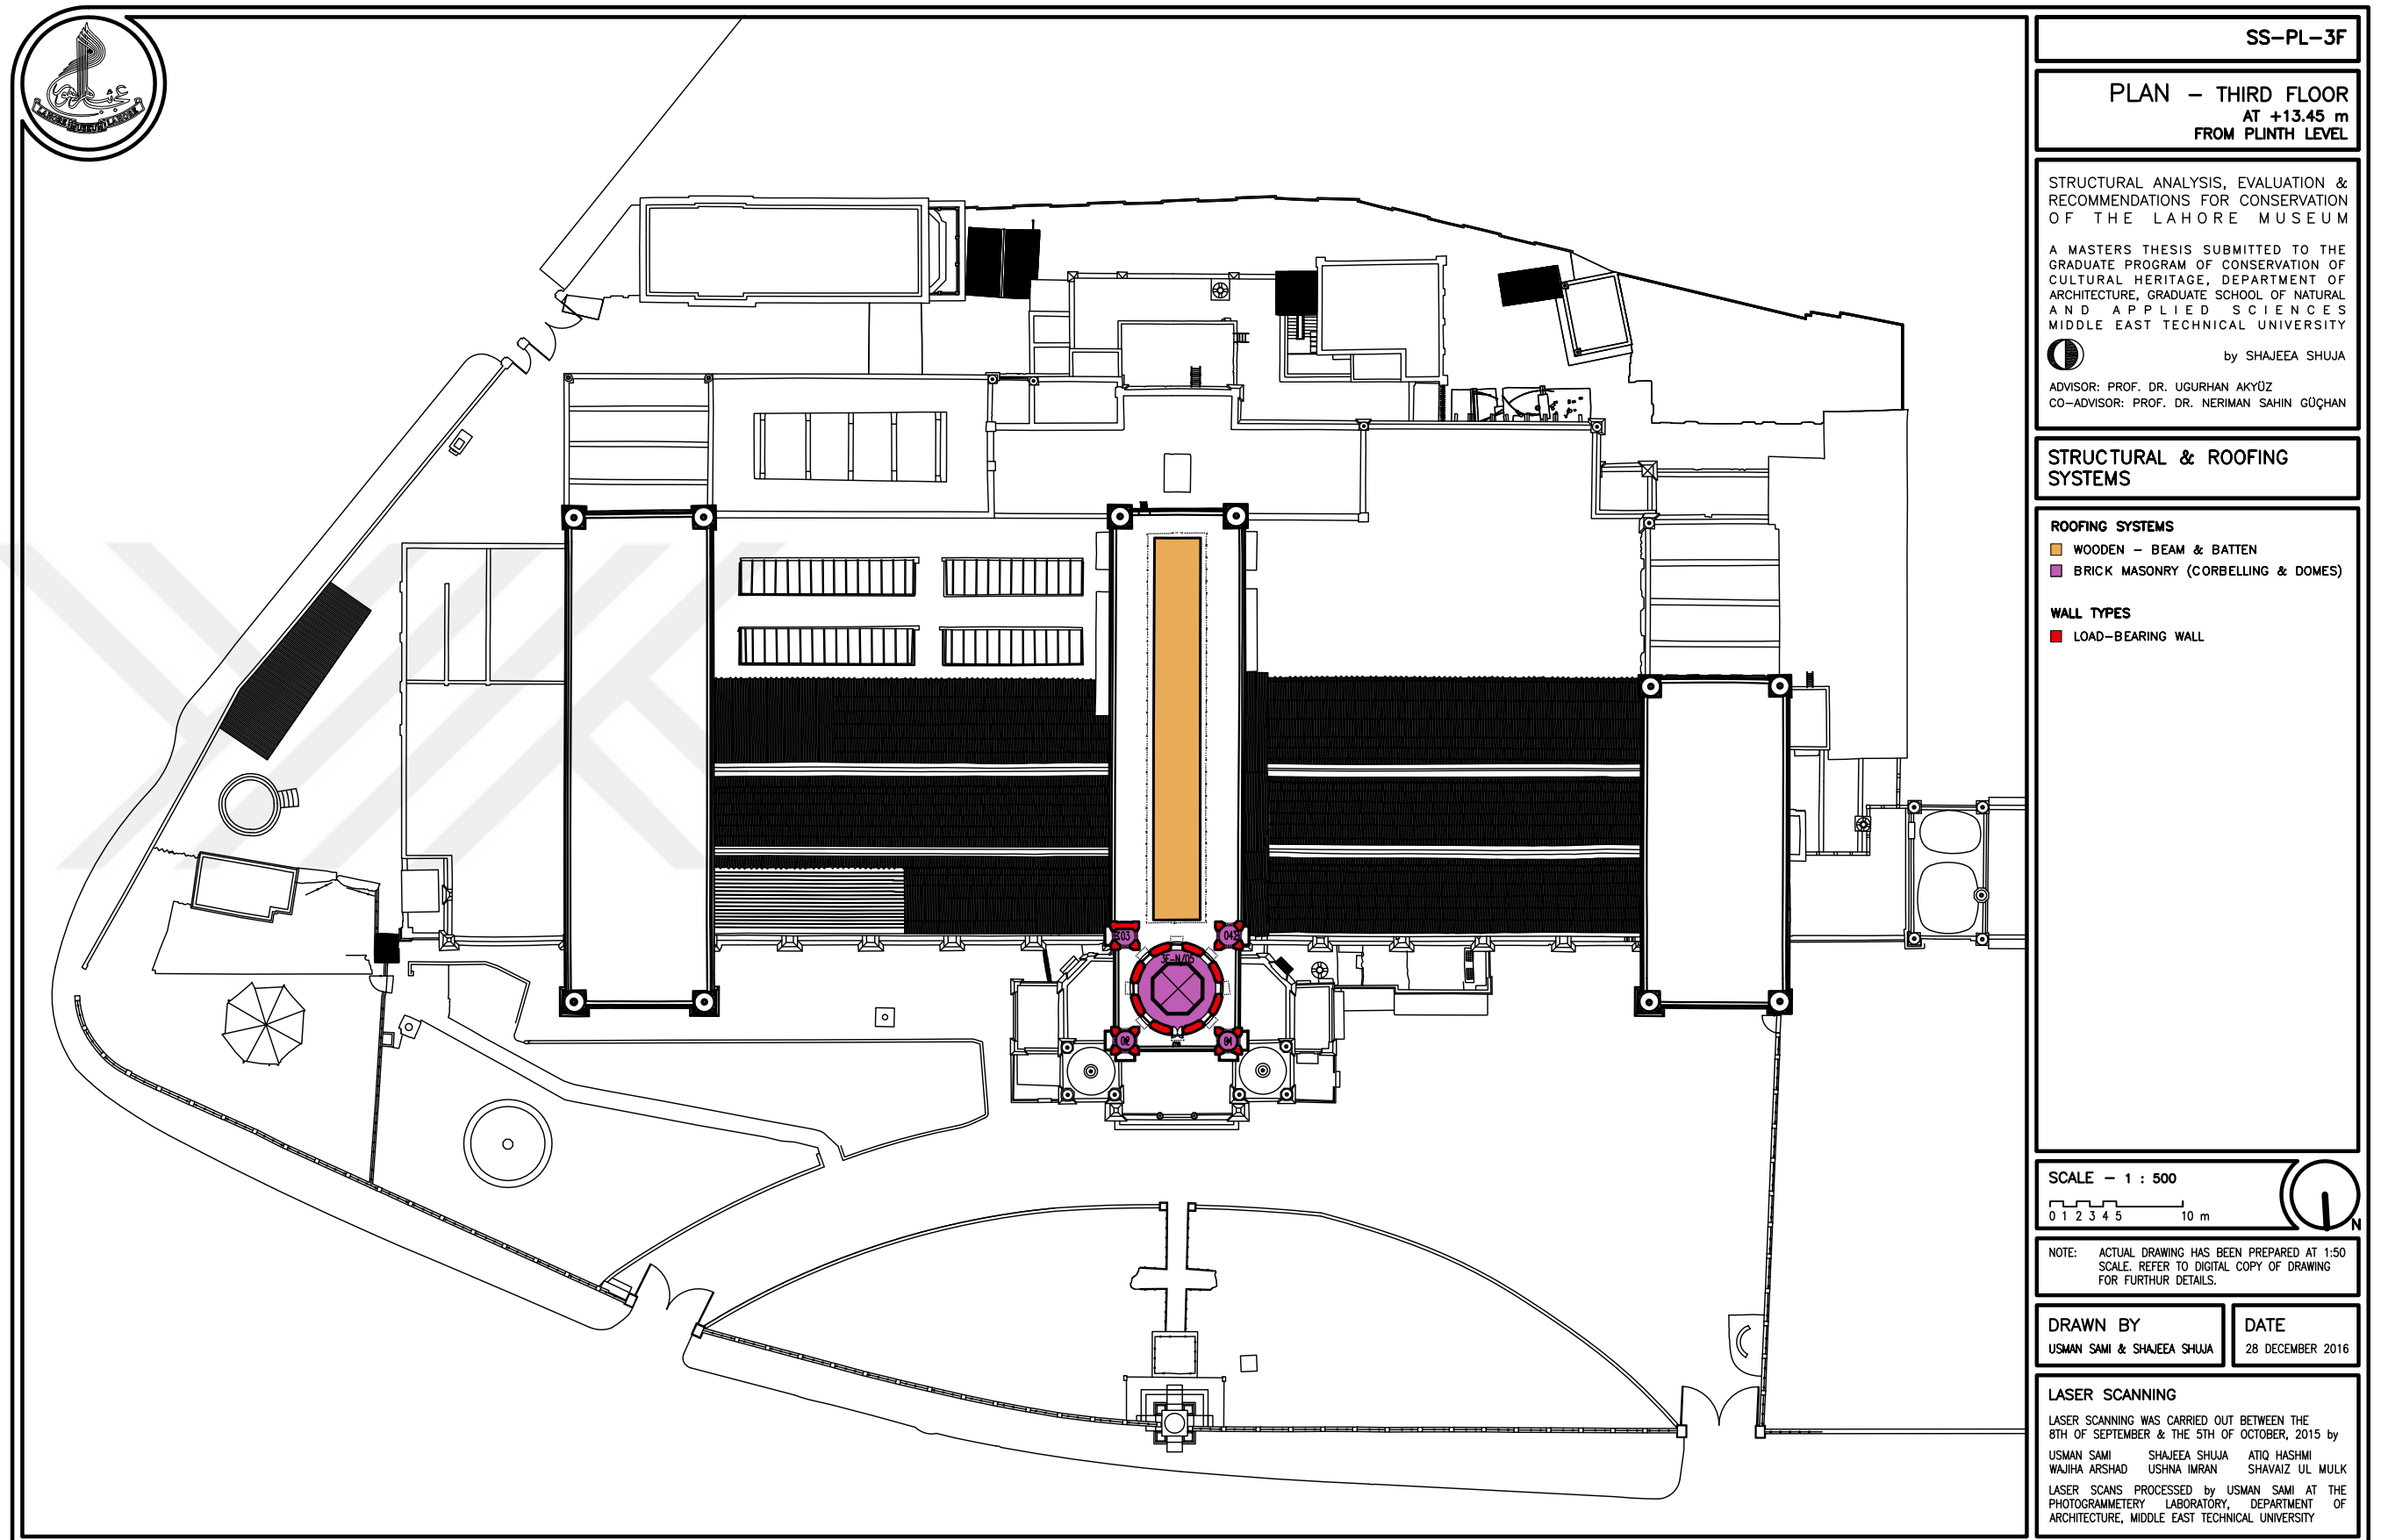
SS-PL-3F – Structural & Roofing Systems – Plan – Third Floor (2016)
